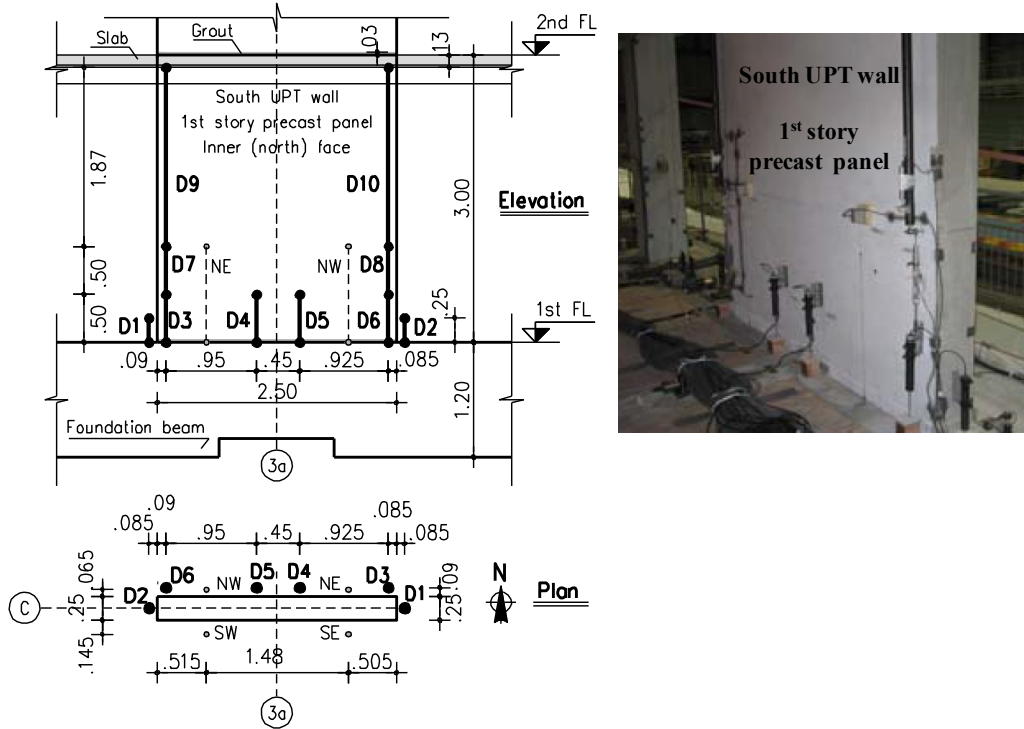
Instrumentation at first story panel of south UPT wall (dimensions in m)
